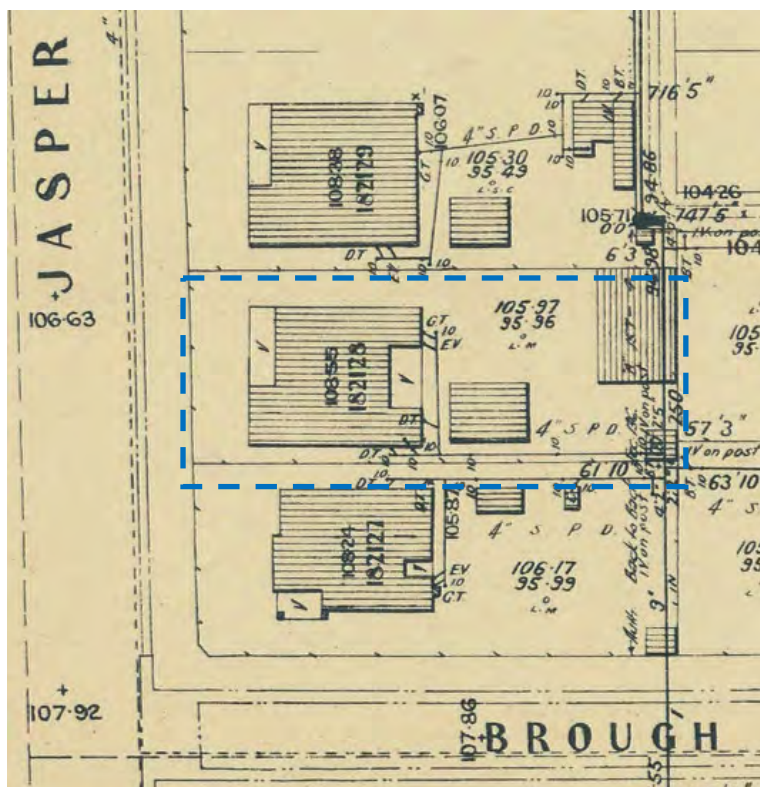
1930 plan of the subject site, with a footprint of the house and outbuildings (Source: MMBW DP 3209, dated 1930).
